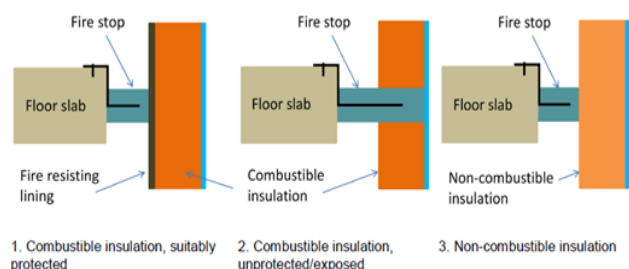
Fire-stop detailing for a curtain wall(Centre for Window and Cladding Technology 2017)
